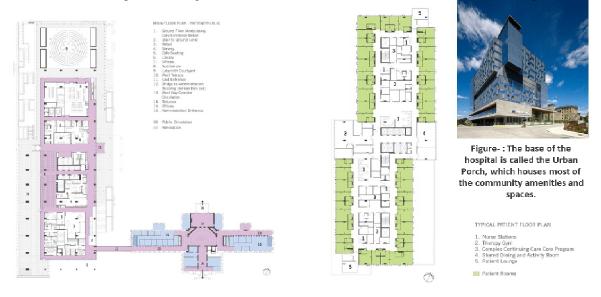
Floor plans of Bridgepoint Active Healthcare, Toronto
